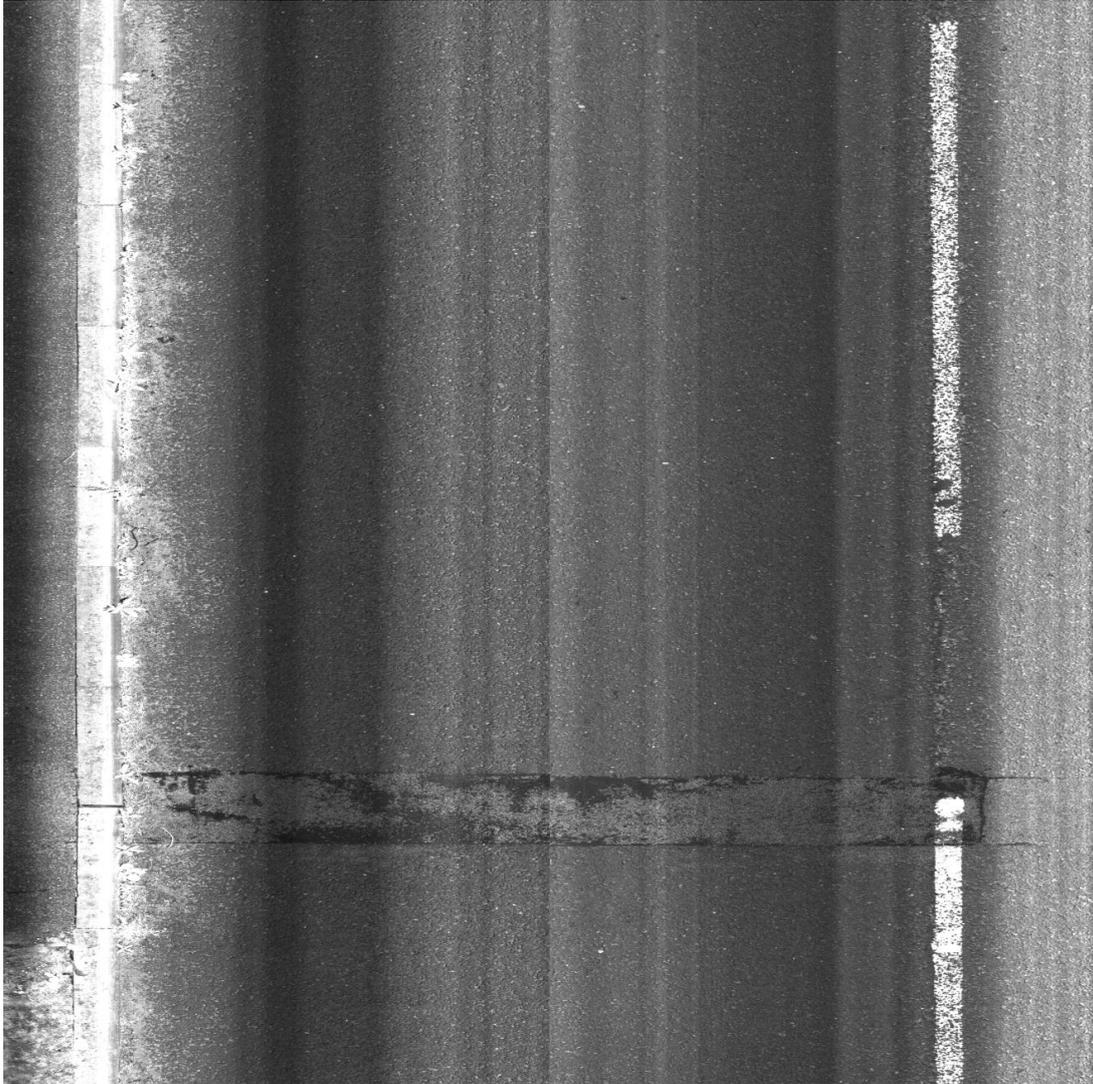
Downward facing images as collected by pavement condition survey vehicle.
